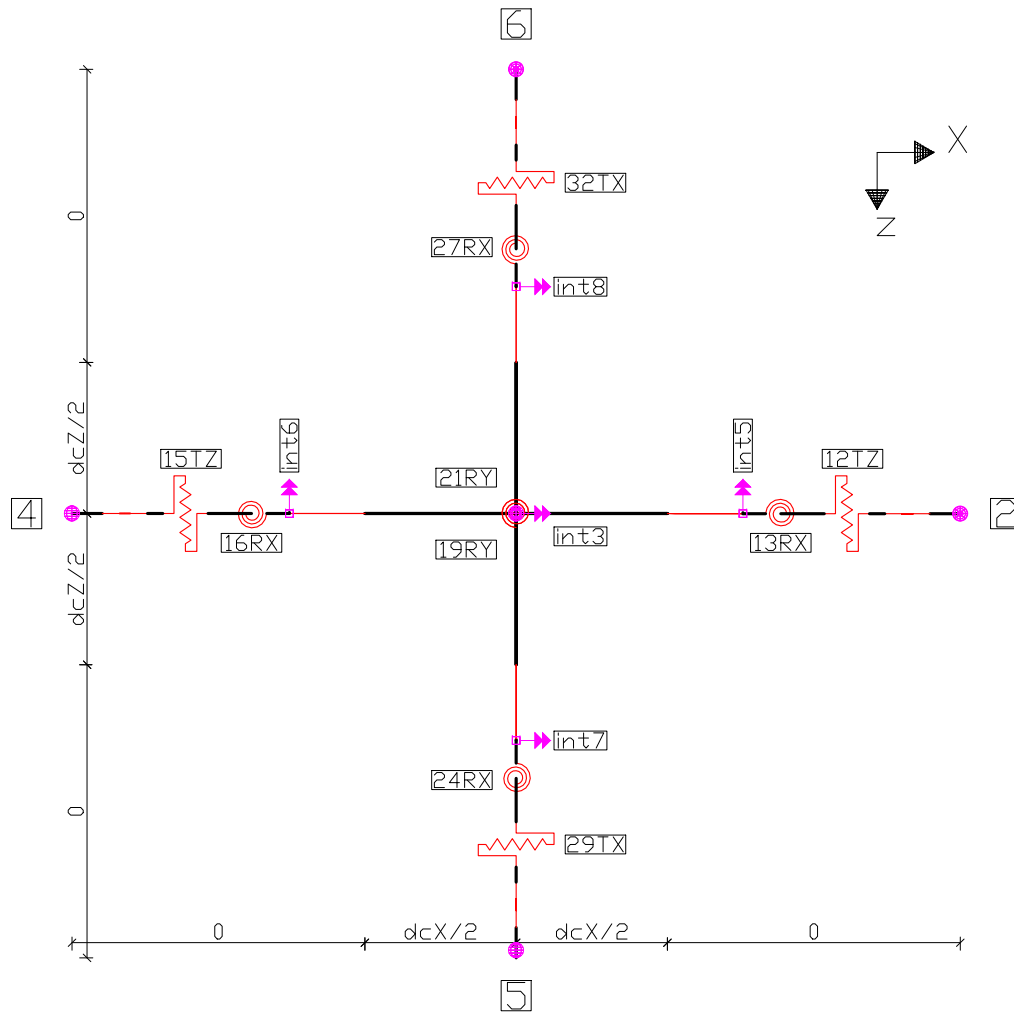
Components of the beam-to-column joint finite element developed within the INNO3DJOINTS project [5]: Z-X plane.
